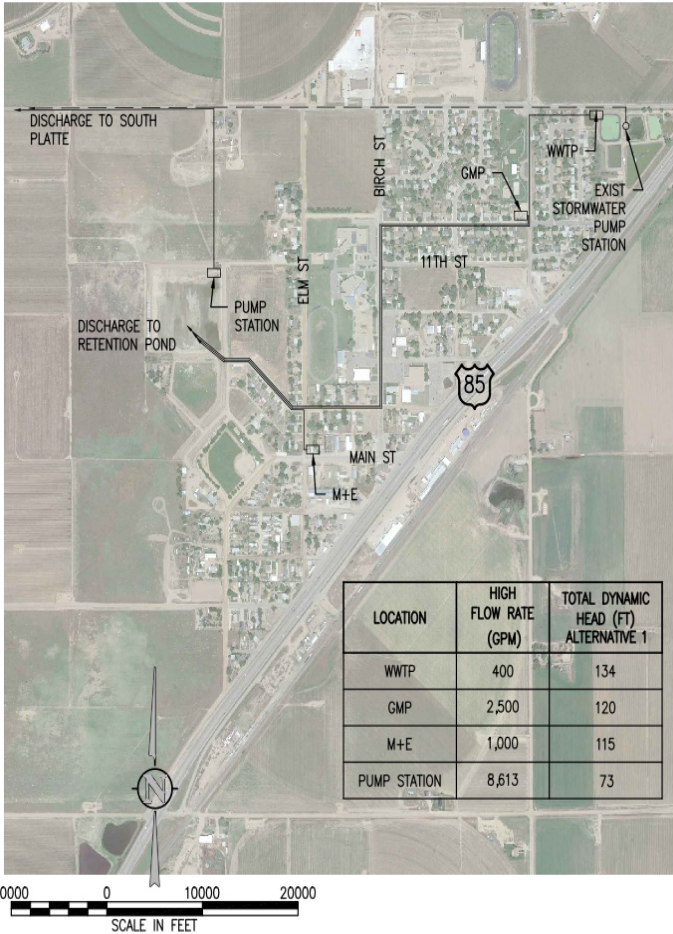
Dewatering Improvements Study proposed dewatering wells for the Town of Gilcrest
